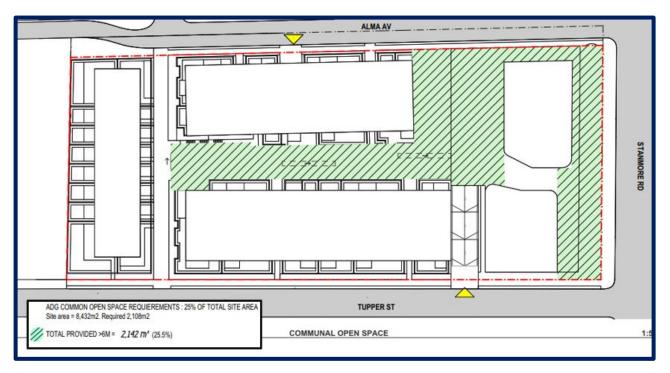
Proposed communal open spaces (Source: the planning proposal)
